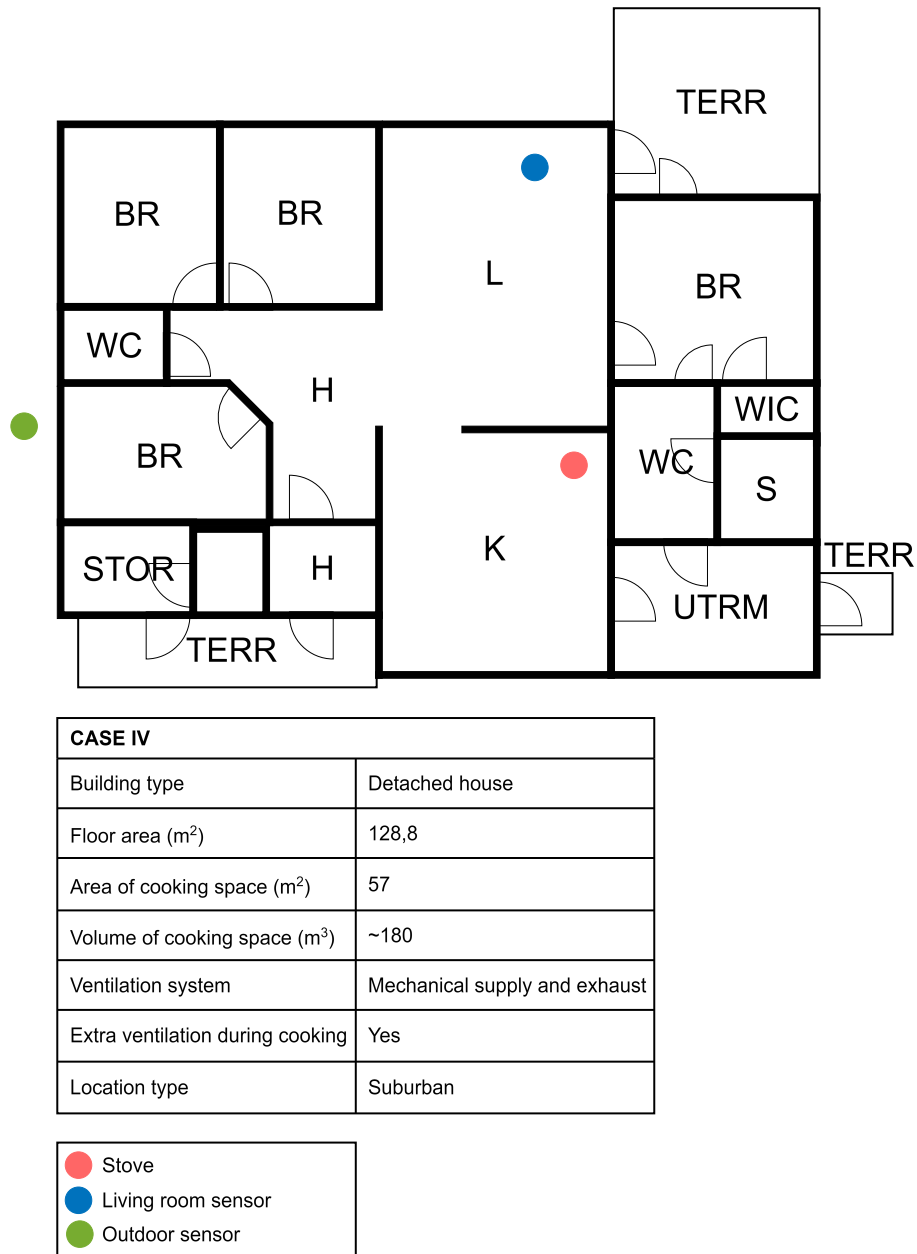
Floor plan and description of the apartment used in Case IV.
